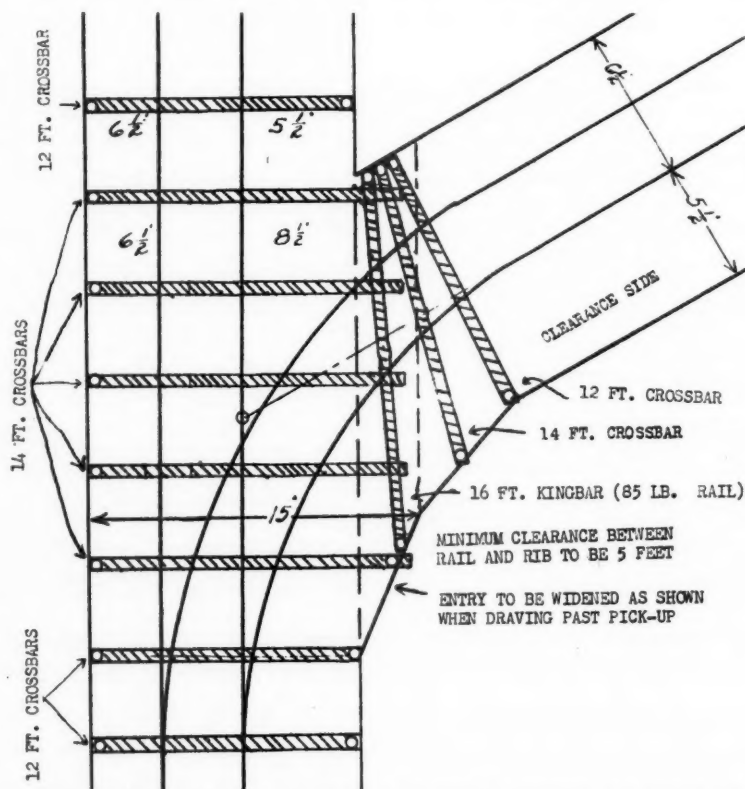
Timbering plan for starting a new place providing adequate roof support and walkway clearance
